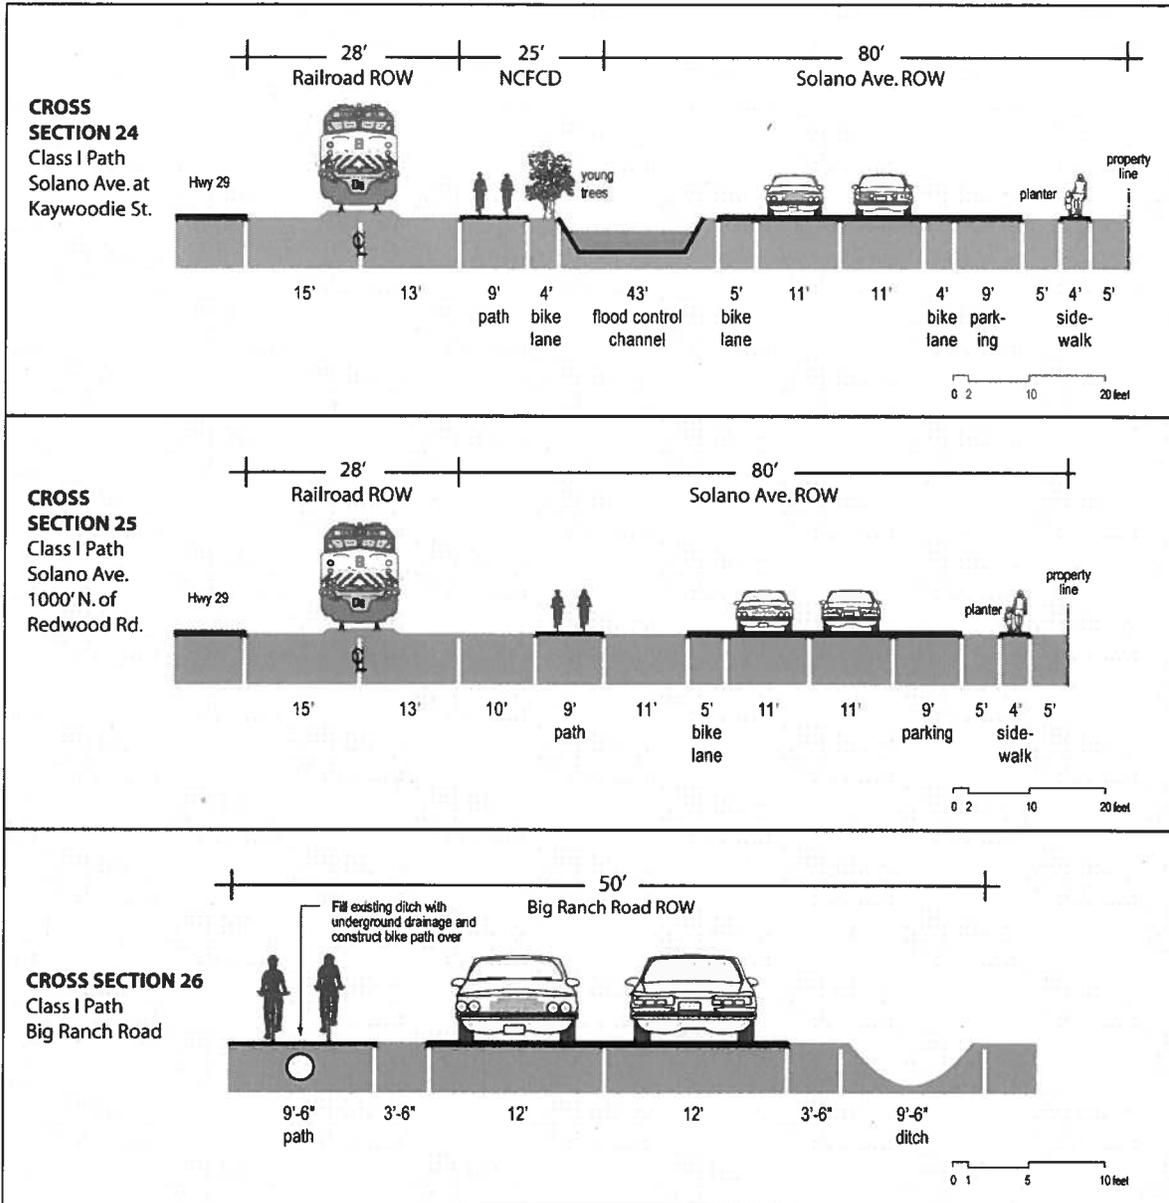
Napa Valley Greenway Typical Cross Sections
